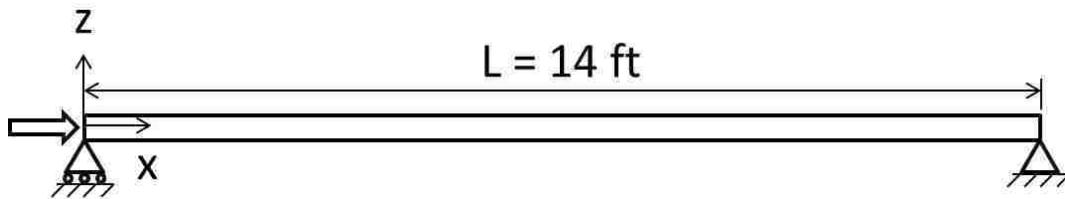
Illustration of Foam-Filled Steel Column (Plan View), Modeled as Simply-Supported Compression Member
